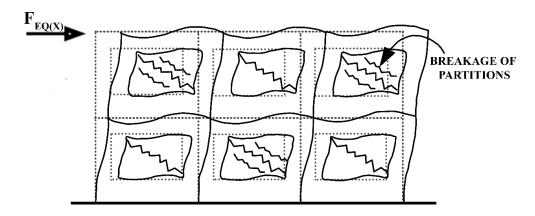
Deformation based failure in the in-plane loading (Adapted from FEMA 74, 1994)
